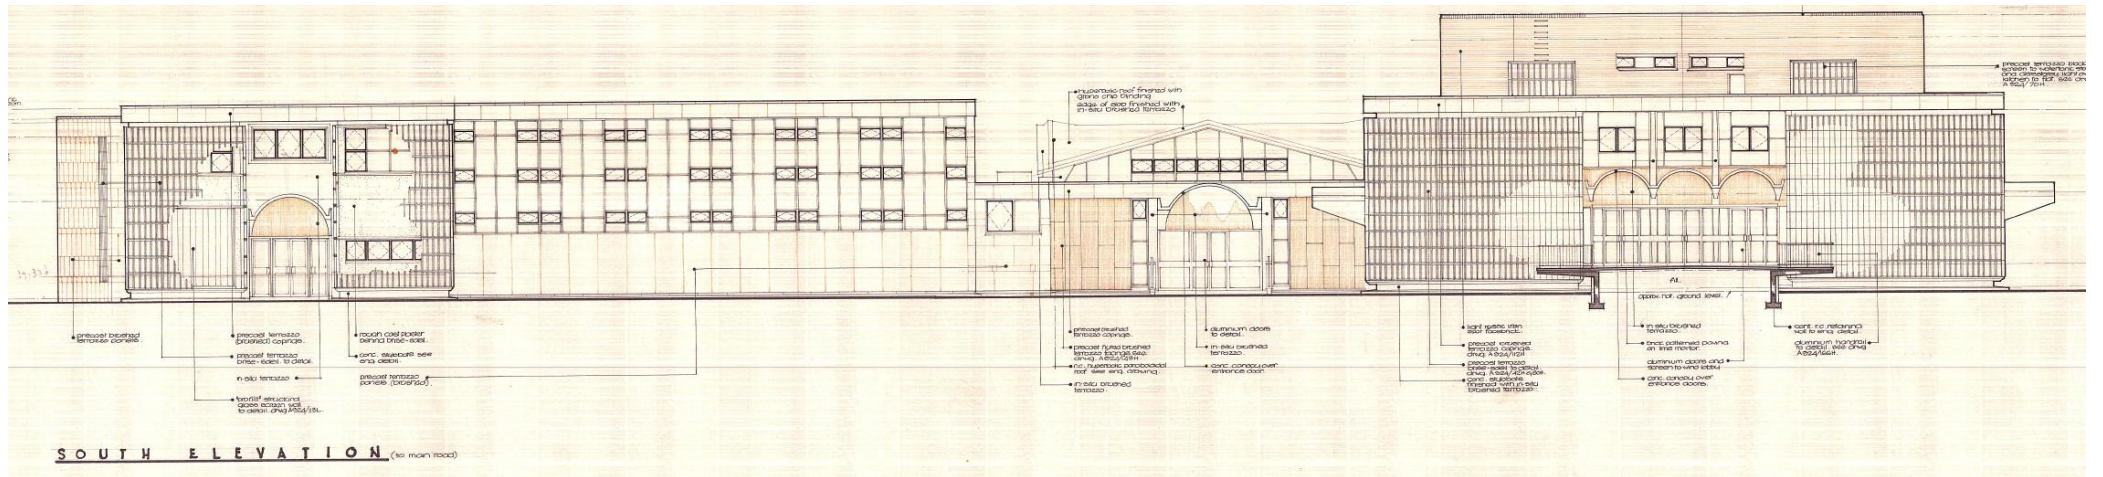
South elevation of the building (Extract from working drawing A924/92 by DJ Greeff, 1964, designed by G Ramsay) (Source: CoCT)
